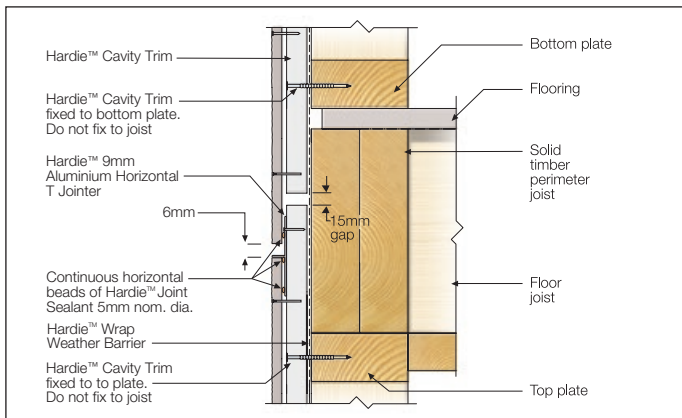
FLOOR LEVEL JUNCTION HORIZONTAL T-JOINTER OPTION
